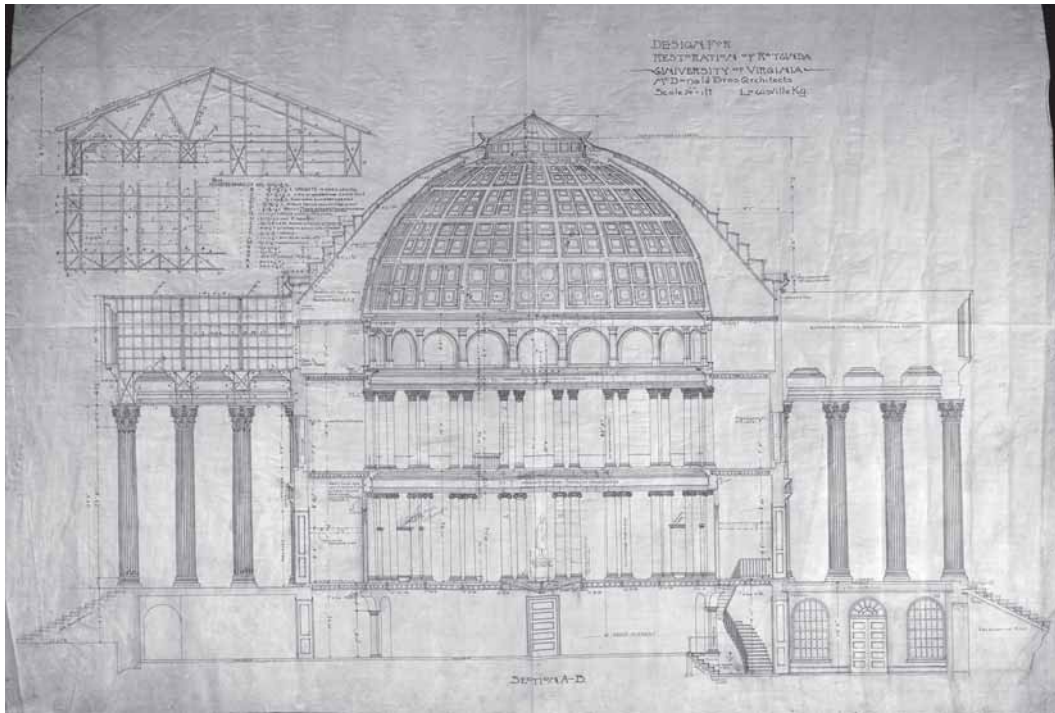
McDonald Brothers section, looking west through the building. [Special Collections, UVA]
